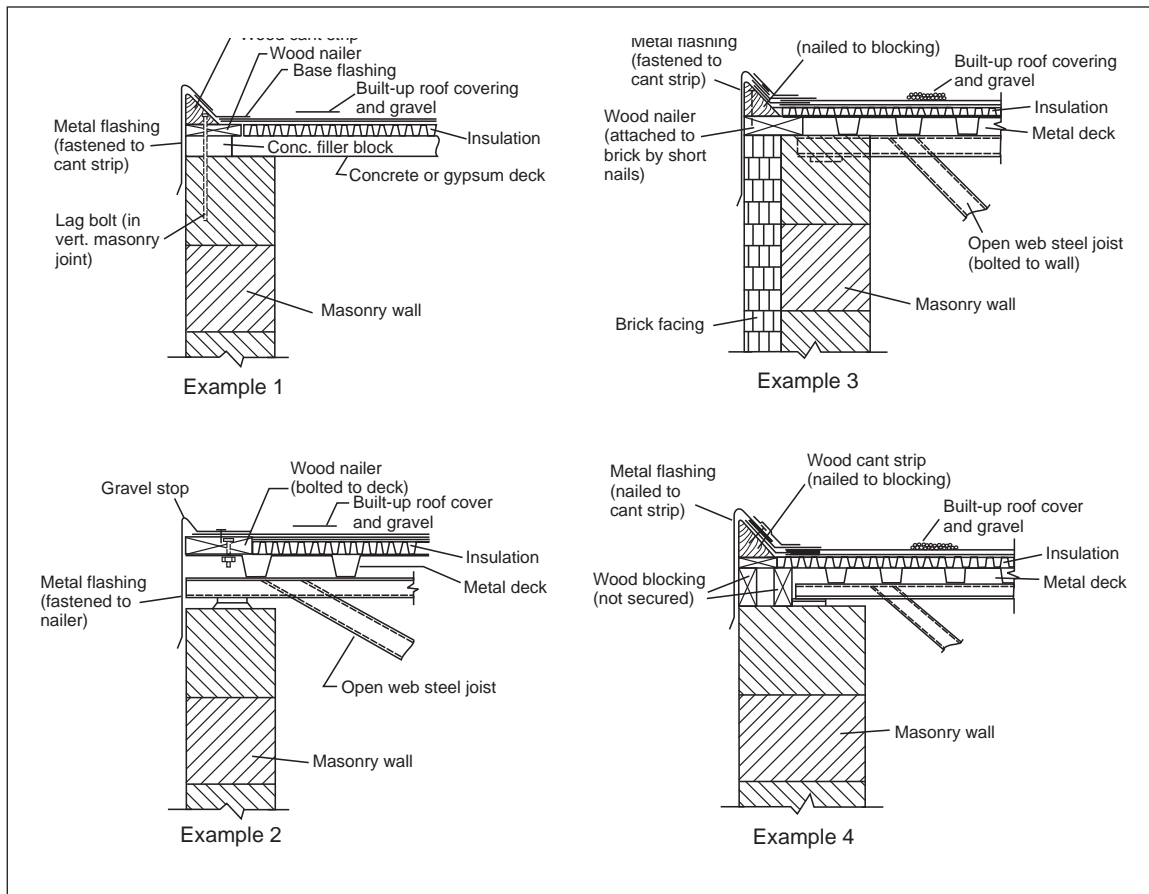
Examples of perimeter flashing installations THAT ARE NOT RECOMMENDED
